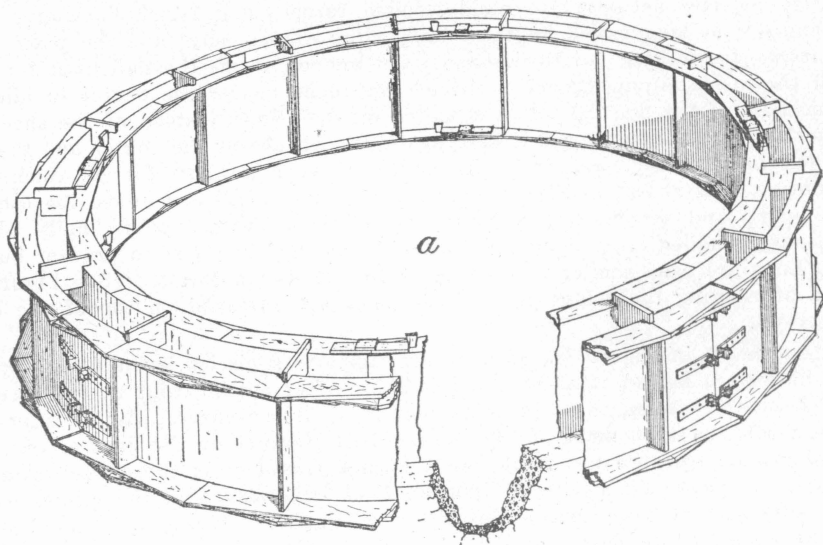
Metal and wooden form for a concrete silo. They may be used for constructing concrete collar above or inside form may be used in putting in concrete wall from bottom of pit silo to the top.
